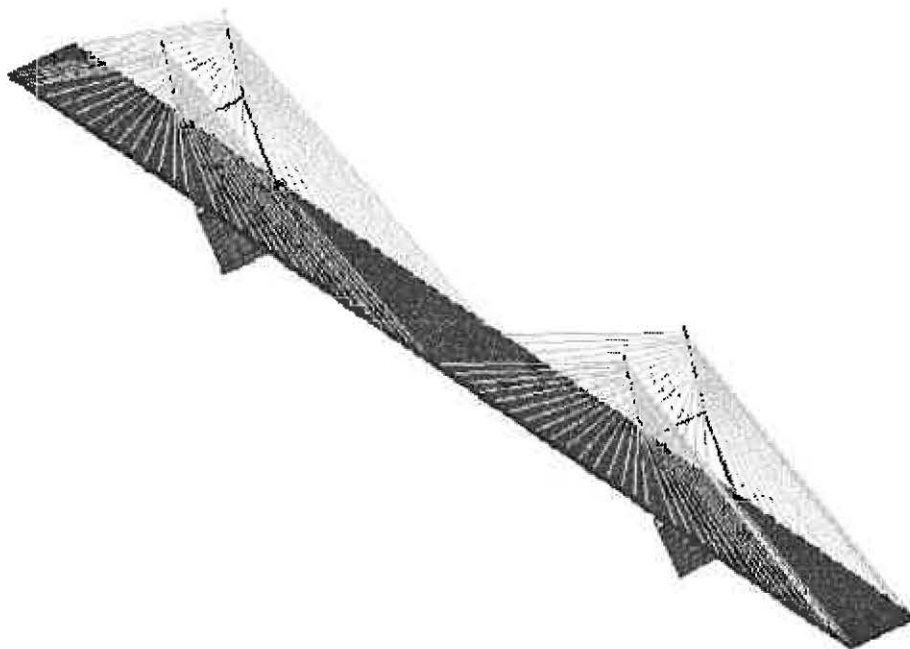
3-D Finite Element Model of Bill Emerson Bridge
